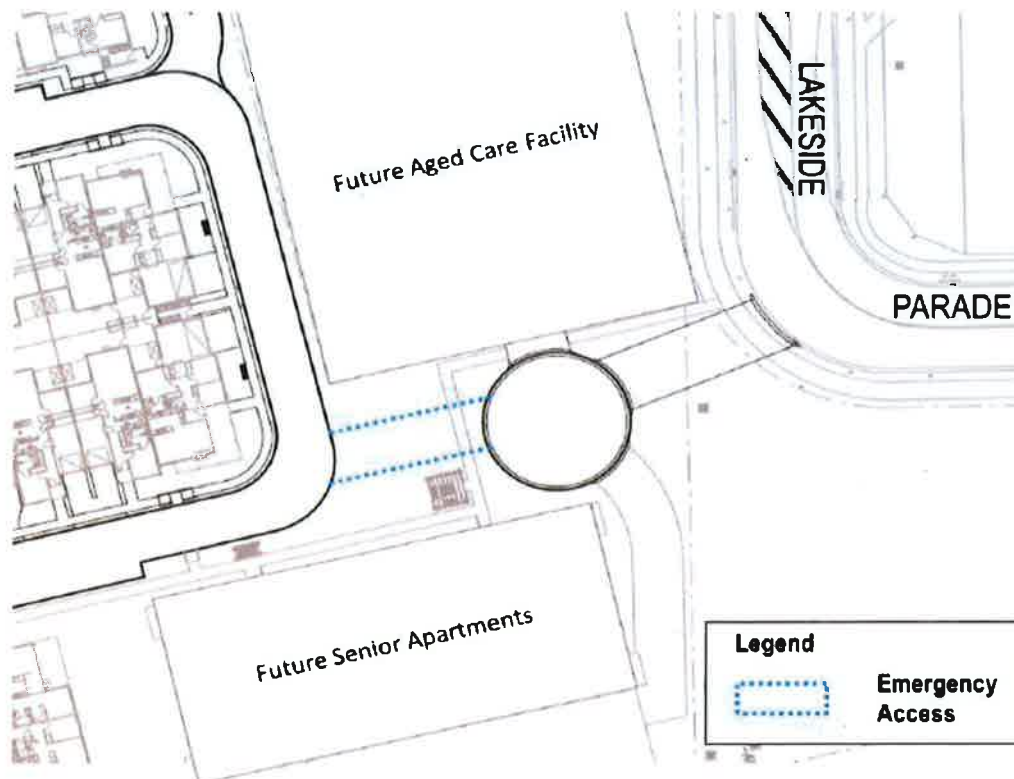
Proposed Lakeside Parade access to site (Source: Bitzios Consulting)
